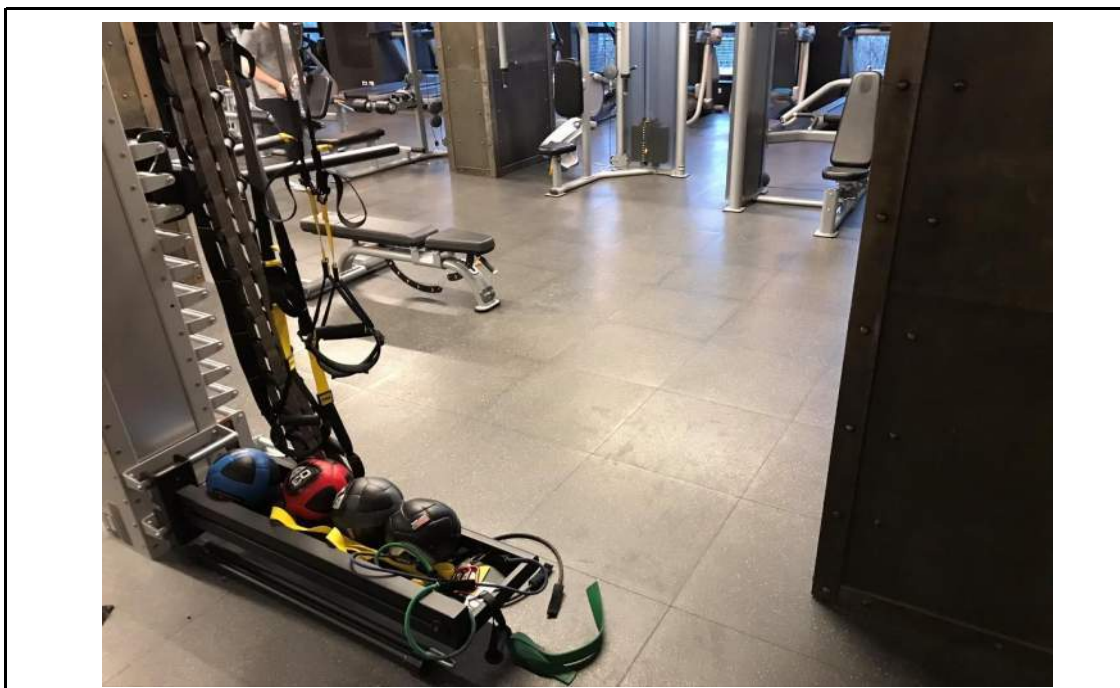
First floor concrete slab covered with soft tiles within the gym, facing east. 6 February 2020.
